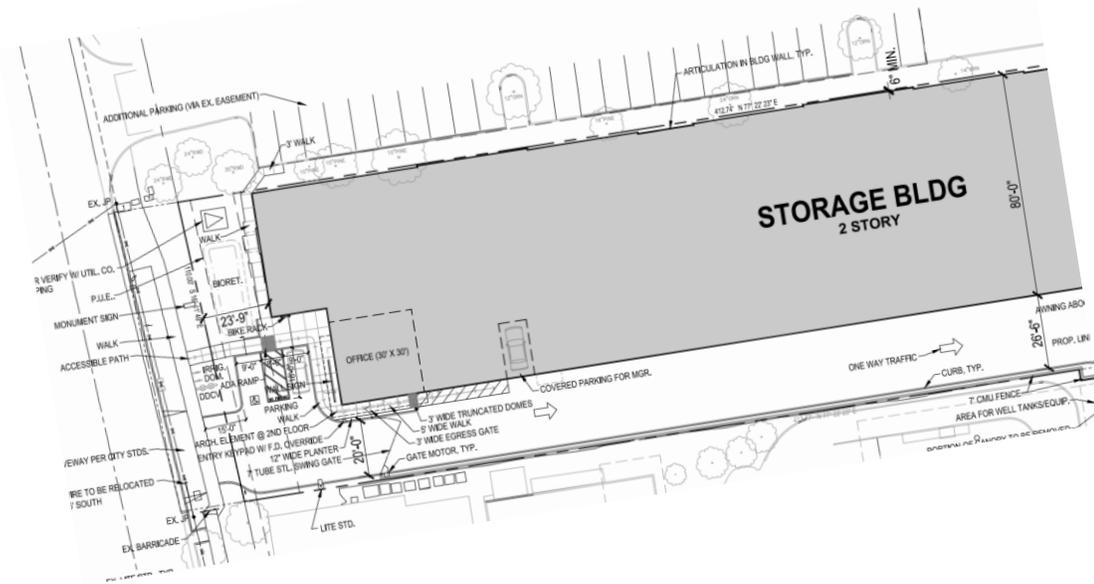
Partial Site Plan – Source: Cubix Construction Site Plan, June 2023
